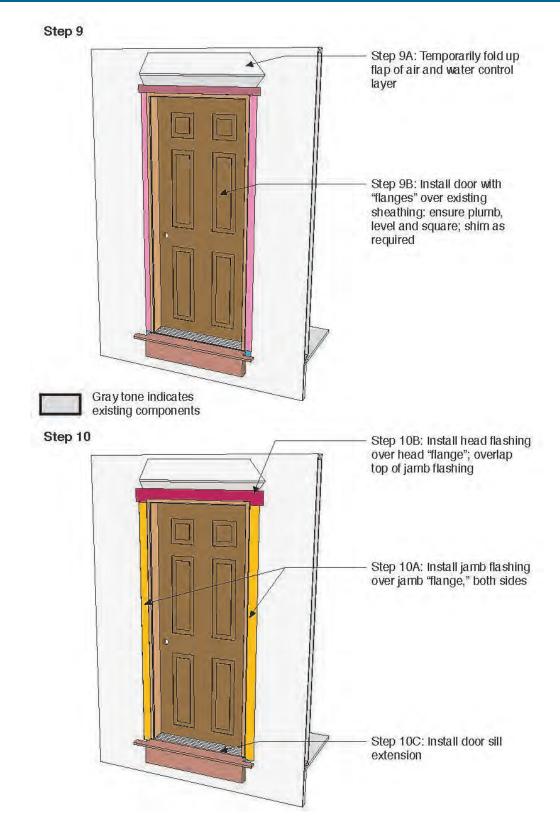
Steps 9 and 10 of installation sequence for new door or reinstalled door in a high performance mineral fiber retrofit wall assembly
